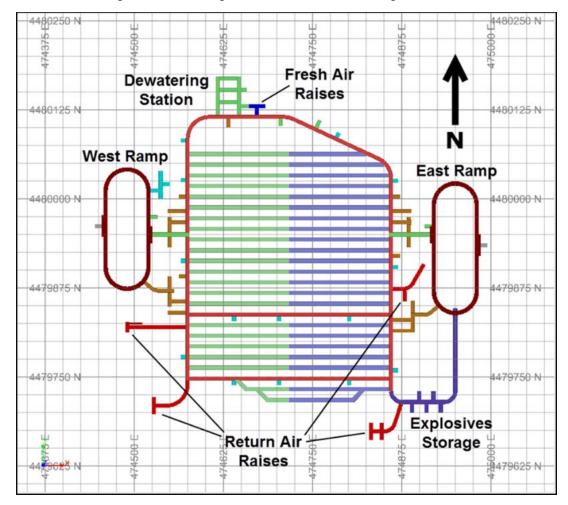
Typical Sublevel Arrangement (230 Level)
